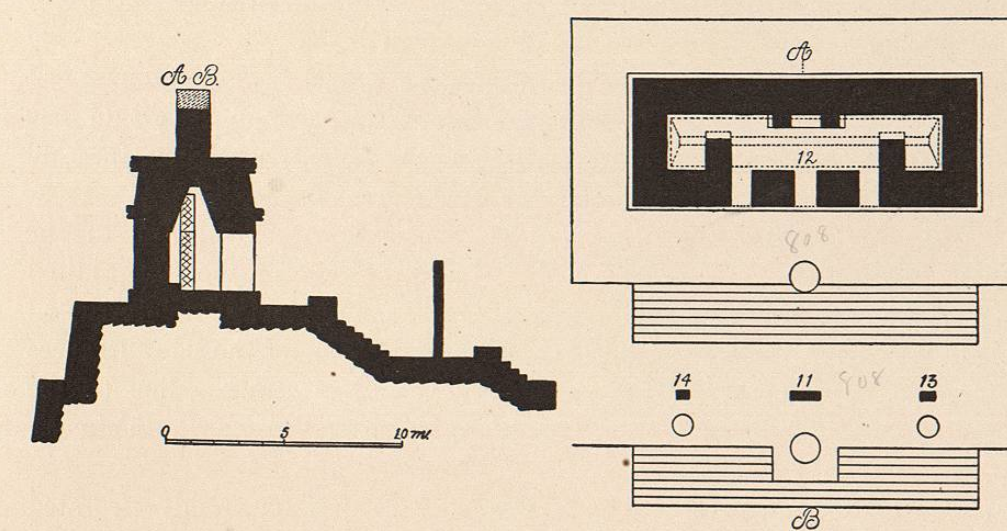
STRUCTURE 40: SECTION AND GROUND-PLAN (RESTORED).
